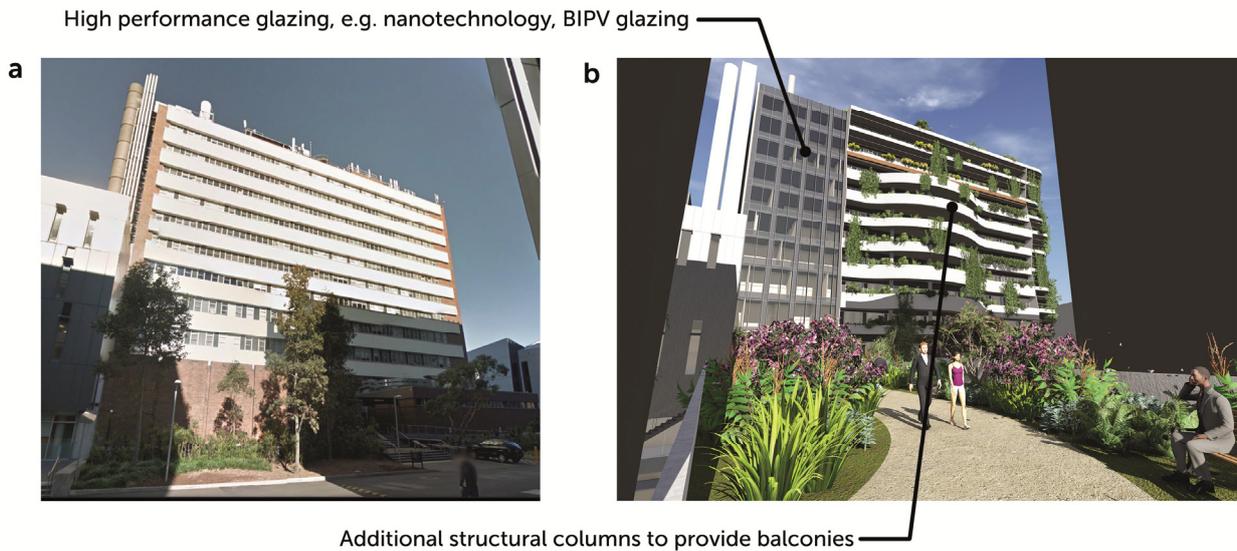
(a) Existing building’s north façade; (b) Retrofitted building’s north façade.
